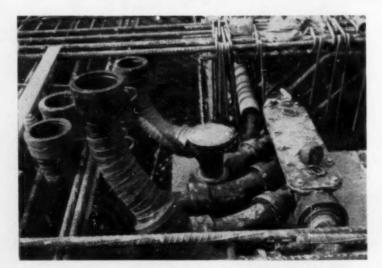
Connections at ground floor showing how pipes are accommodated in the cellular raft over the piles. The pipes are wrapped in a treated paper
